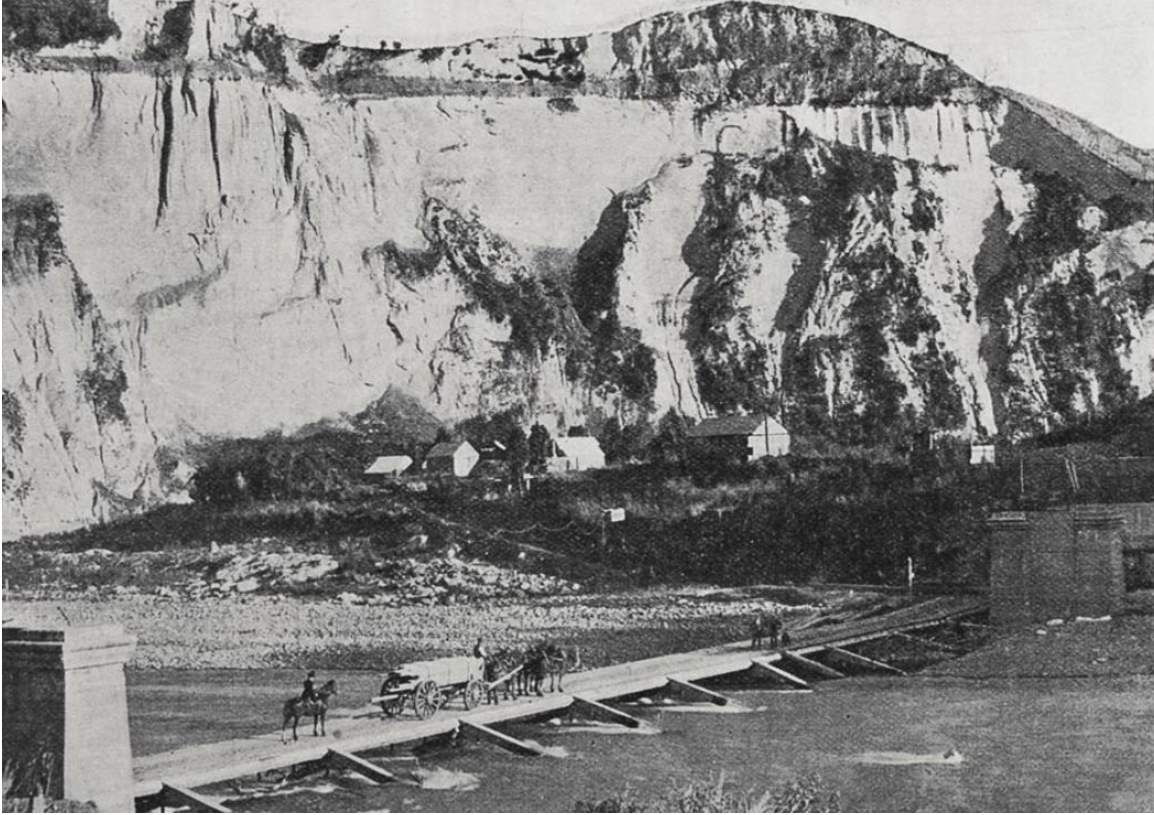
Workers' camp, taken prior to extending the concrete piers in 1904 (Auckland Weekly News photo)
